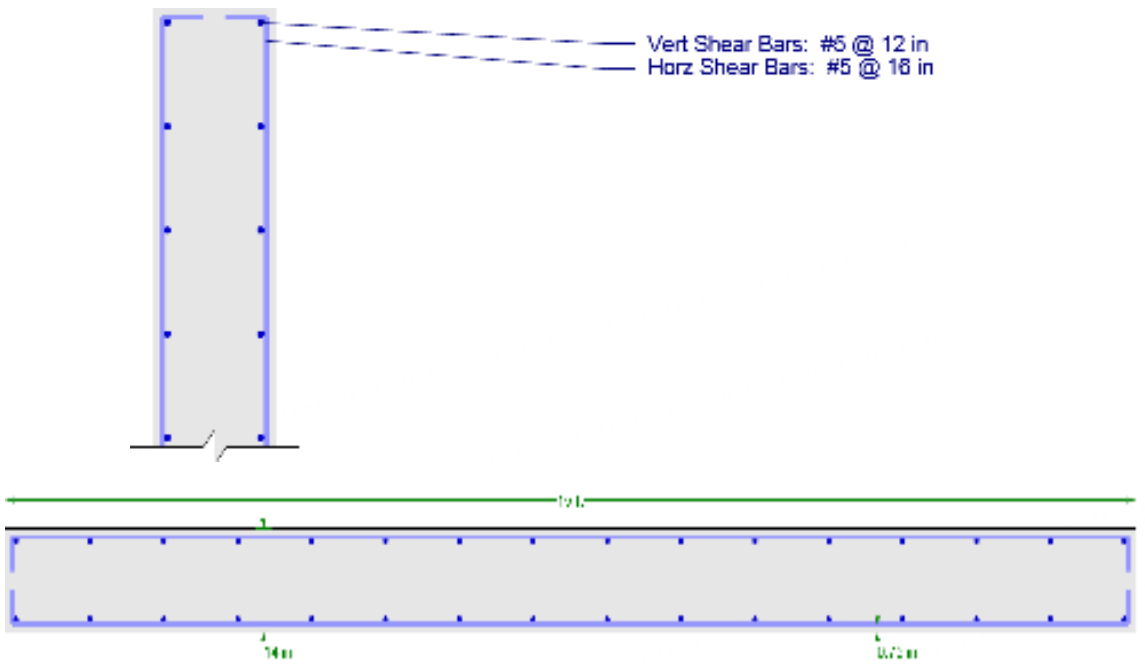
Building (B12-12S-L-O) Ordinary RC Shear Reinforcement Details; Wall Section for Floors 4-6
